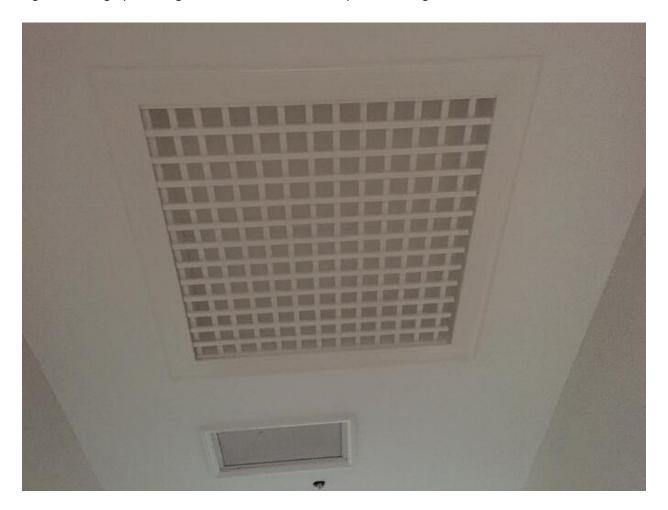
Photograph of Original Attic Fan Vent Grill in Upstairs Ceiling
